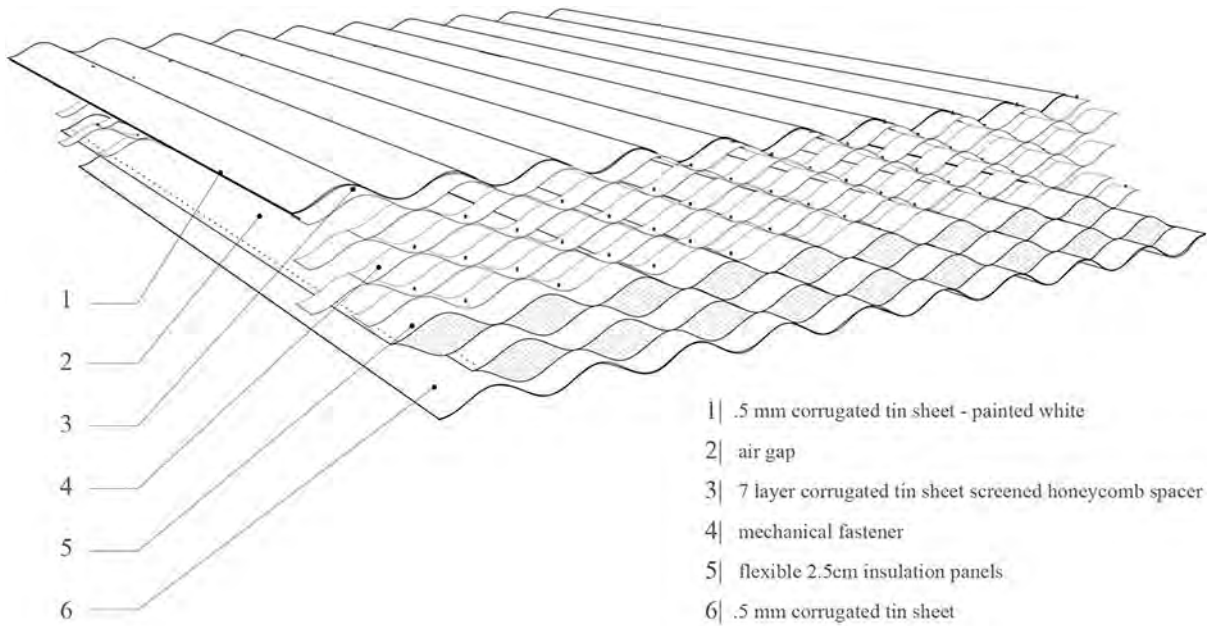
Double-Layer Roof Panel Flexible Insulation – Prototype 2 Design Proposal.
